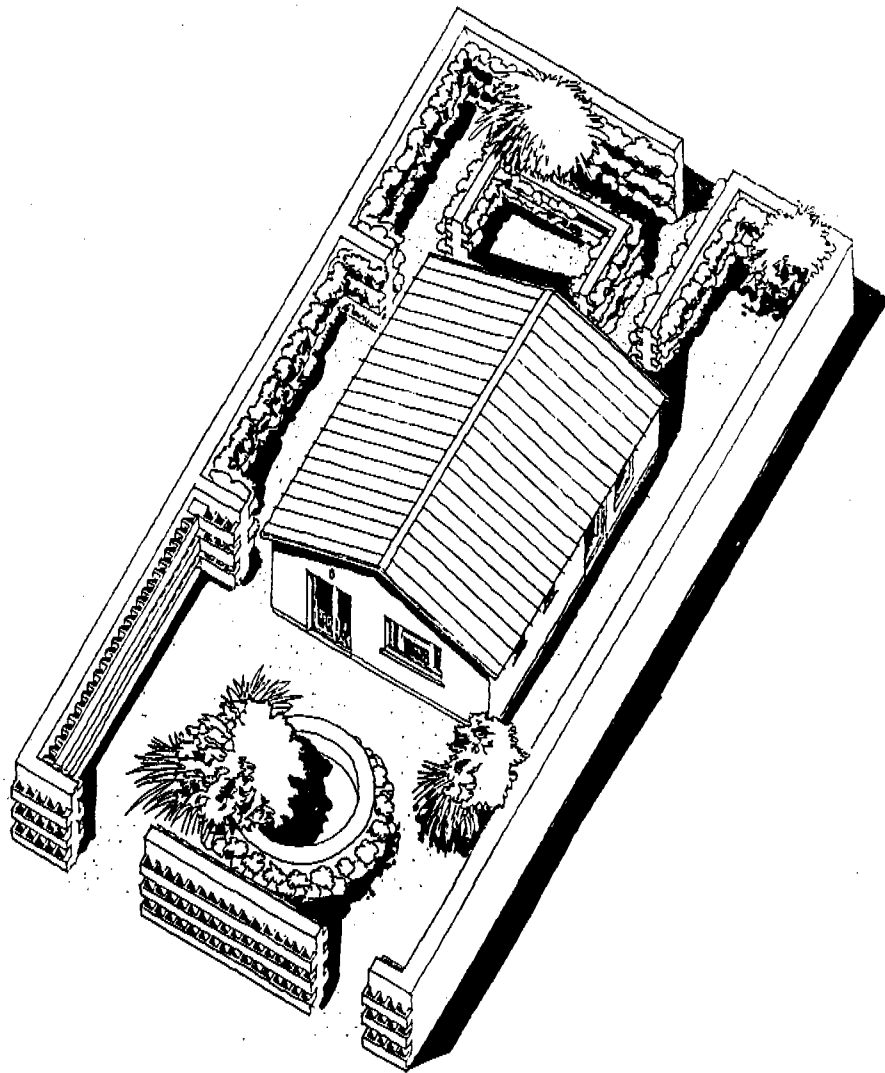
A bird's eye view of the prototype productive homestead under construction at the Sanitas farm. Behind the enclosed garden (outside the picture) is an area with growing benches.
